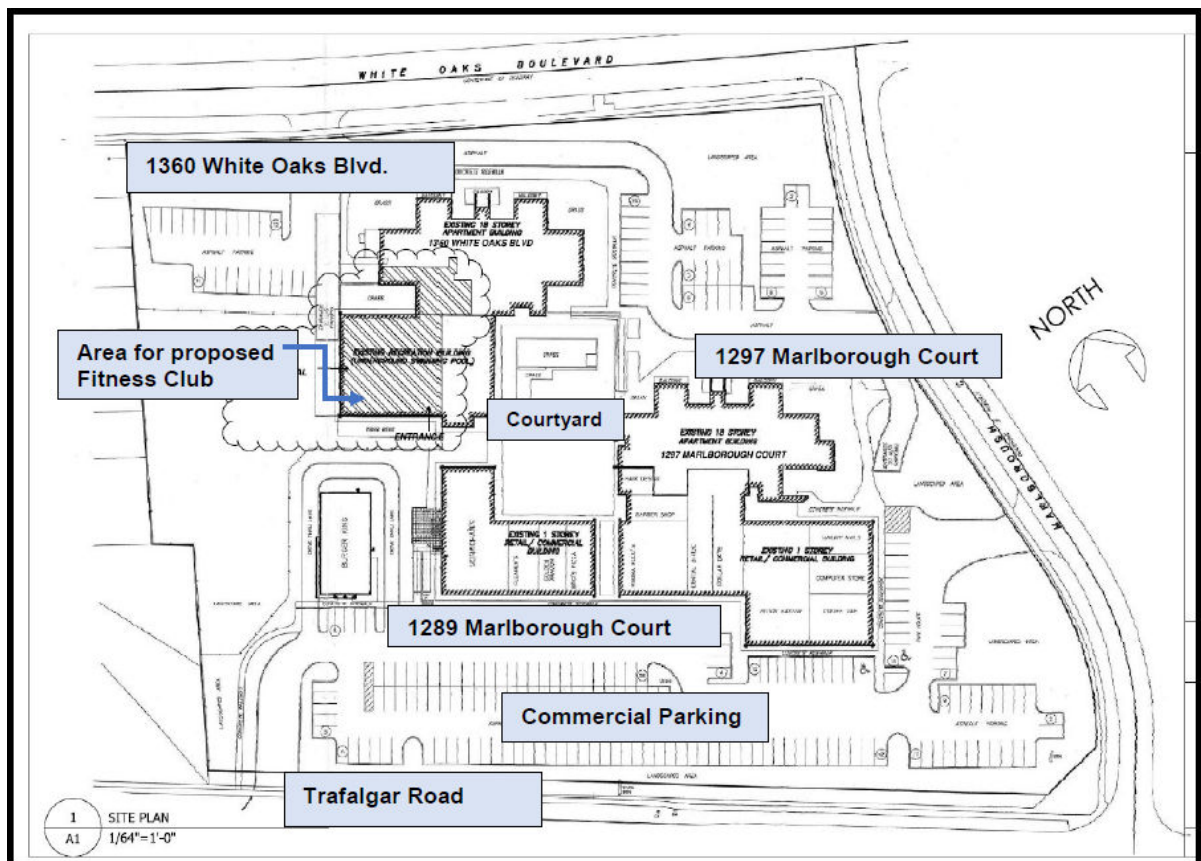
Site showing location of 1360 White Oaks Boulevard and the proposed fitness centre
